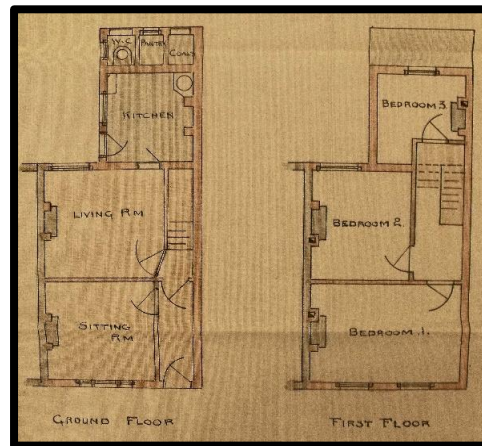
No. 36 Madras Road, proposed ground plan (CA CB/2/SE/3/9/3212)
